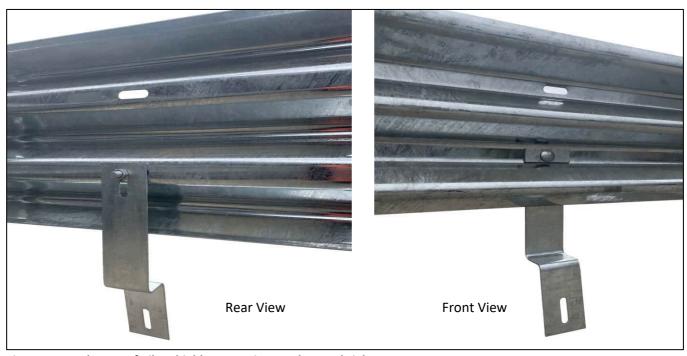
Attachment of BikerShield™ Mounting Bracket to Thriebeam
